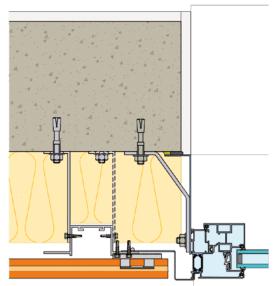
DETAIL : WINDOW FRAME FLUSH WITH OUTSIDE WALL
